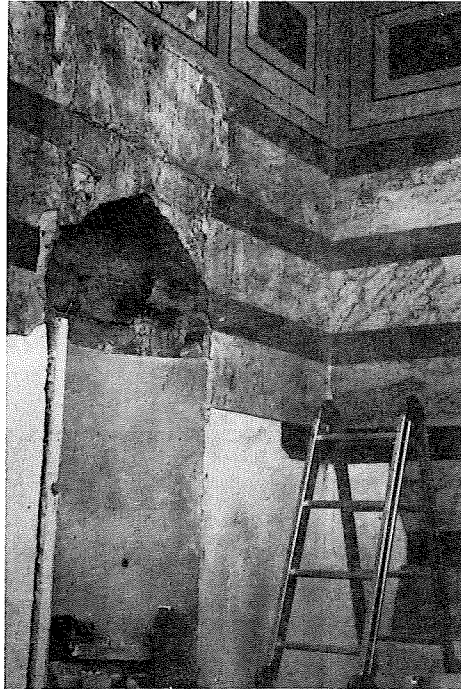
The application of compress plasters on the walls inside the building. These plasters are expected to accumulate the salts from the masonry behind and later on be removed.
